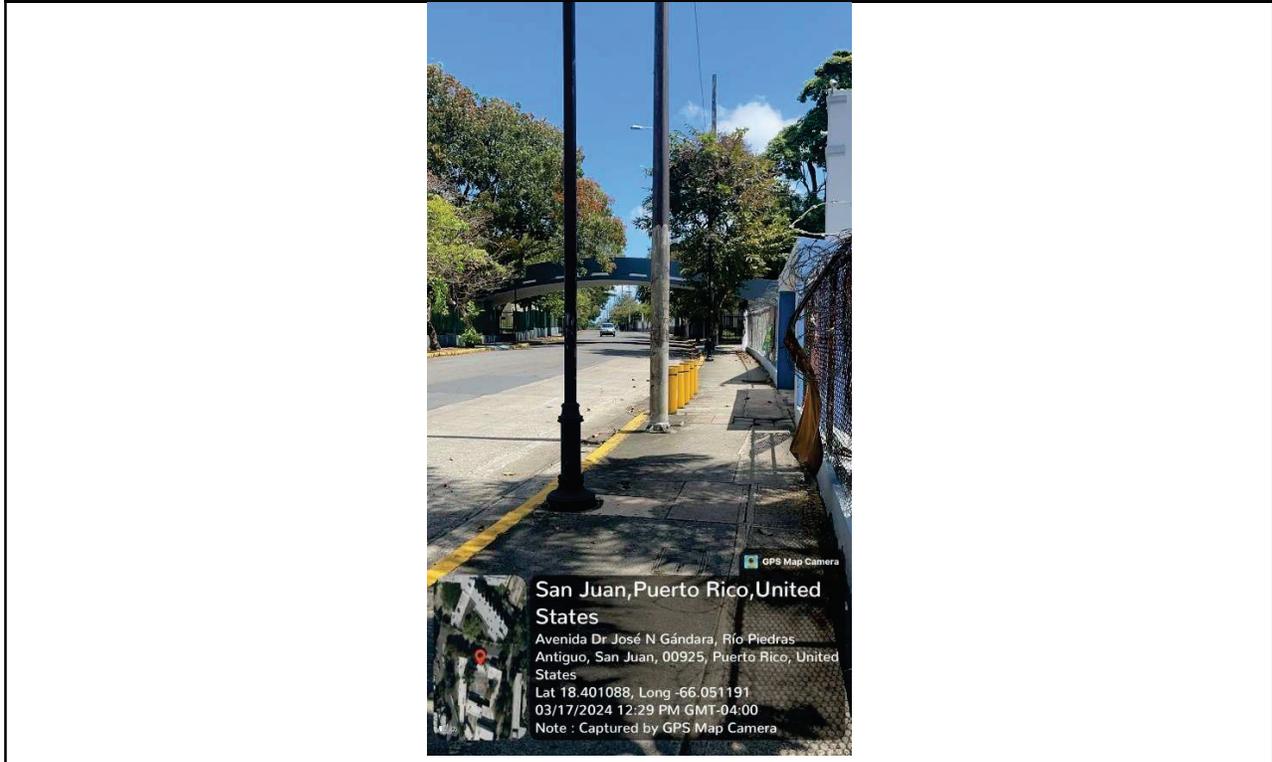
Southwest view of the bridge, looking northeast, from José N. Gándara Avenue.
